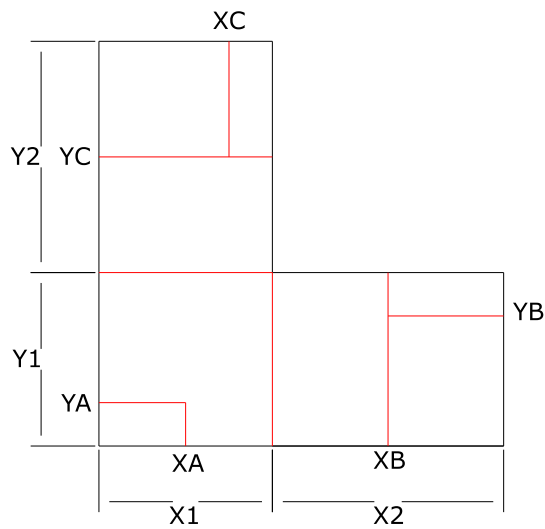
L-shaped structure floor beam layout with AB and AC borders
